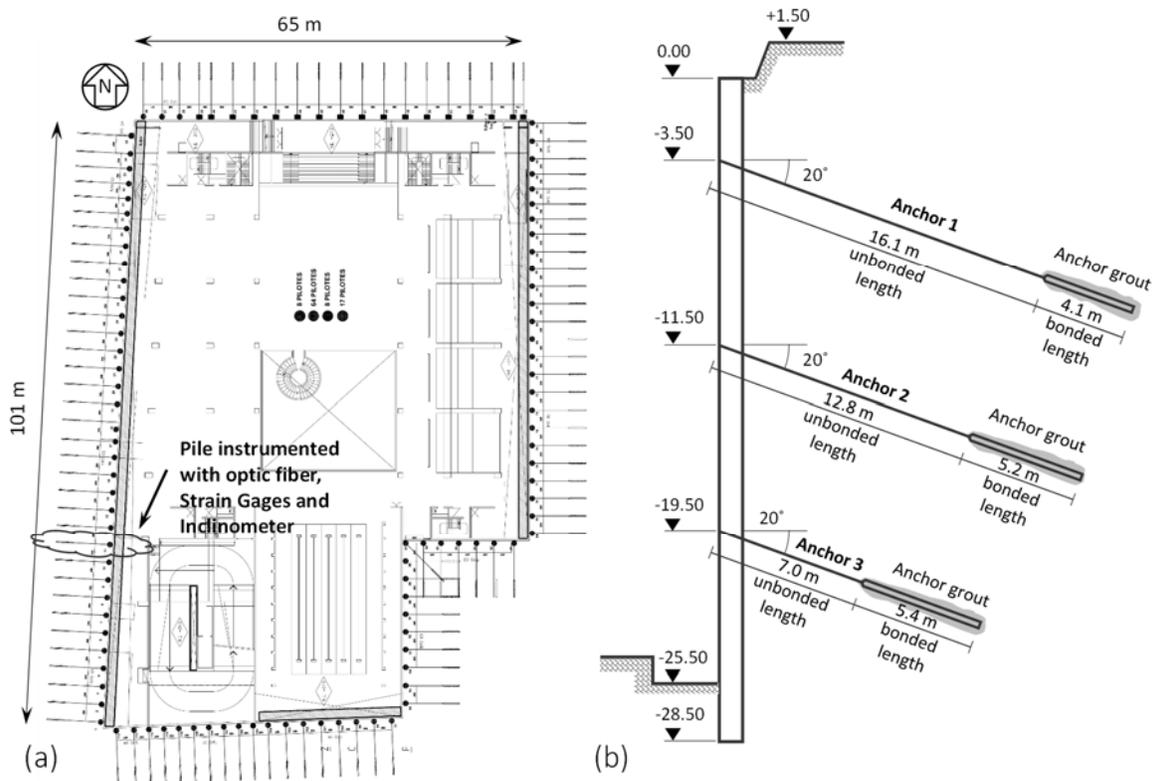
(a) Plan view of the Beauchef Poniente Building and (b) elevation of the studied pile
